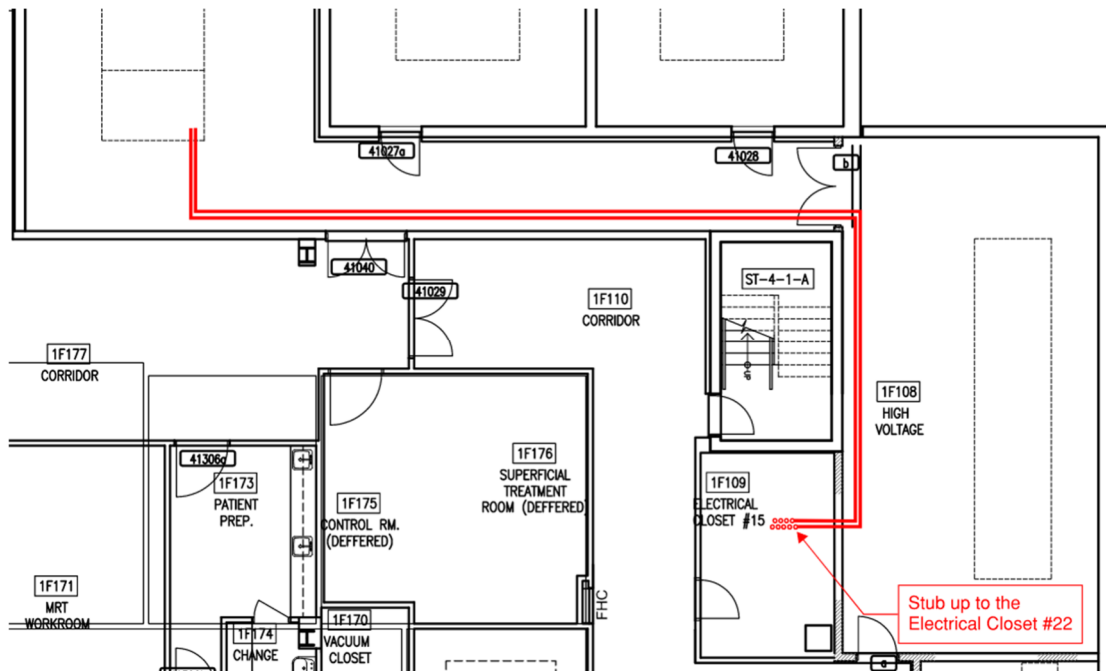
Proposed conduit runs to Electrical Closet #15
